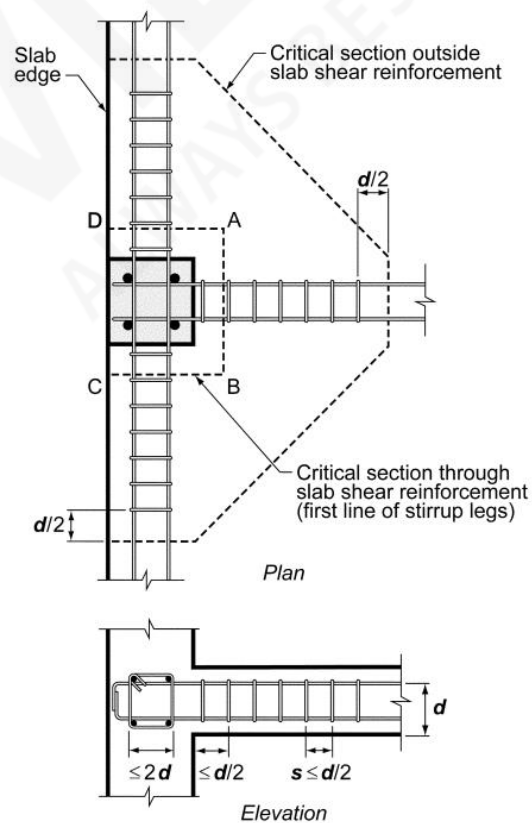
(e)—Arrangement of stirrup shear reinforcement, edge column.
